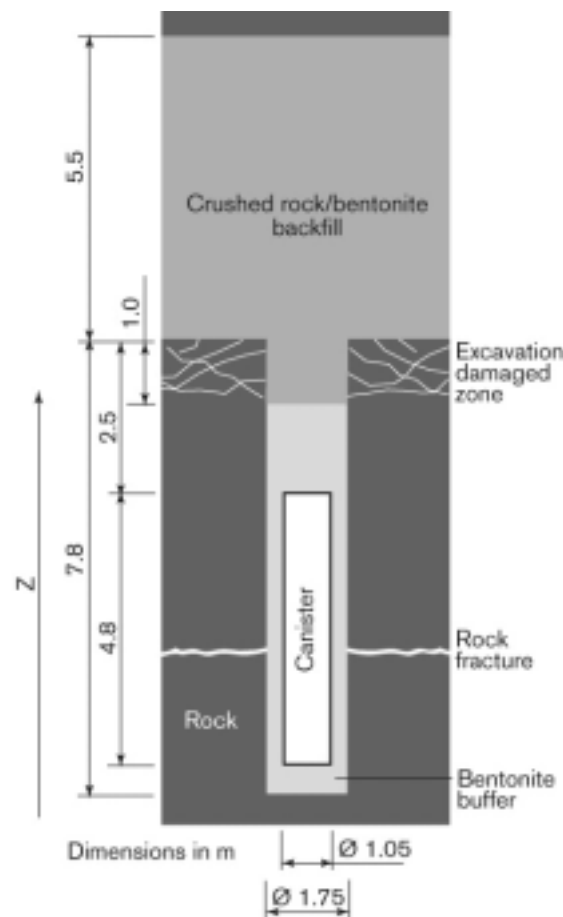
Corrodants in groundwater entering from the excavation damaged zone, EDZ, will attack the canister top whereas those entering from an intersecting horizontal fracture will diffuse through the bentonite and corrode a section of the canister lateral surface of height roughly equal to the thickness of the buffer surrounding the canister lateral surface. Corrodants initially in the buffer will diffuse to and attack both the lateral surface and the top.
